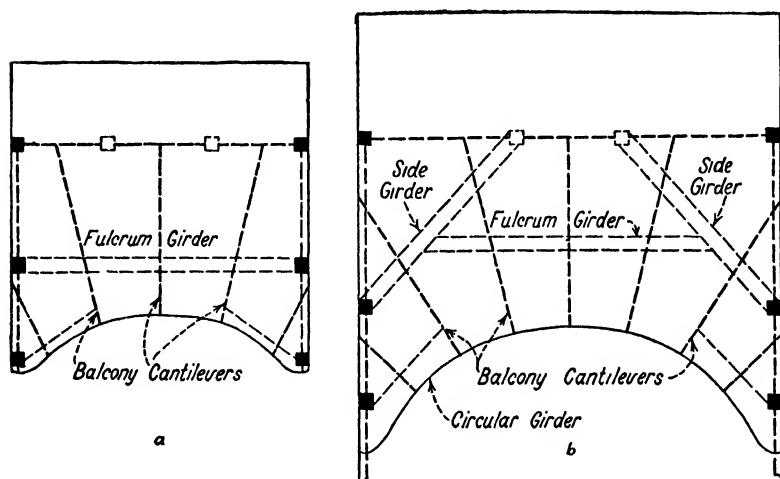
Arrangement of Fulcrum Girders. (See p. 765.)
